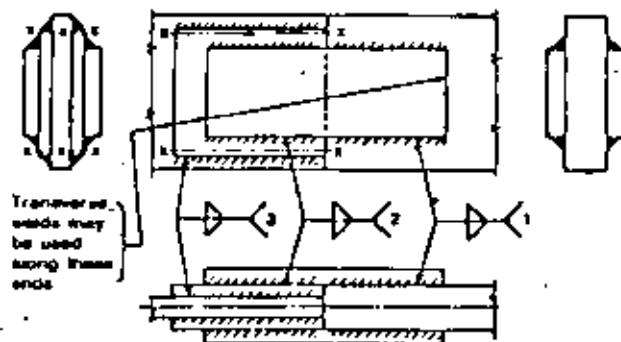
Indirect butt splice test positions for flare groove welds. (Positions for fillet welds are for information only.)
